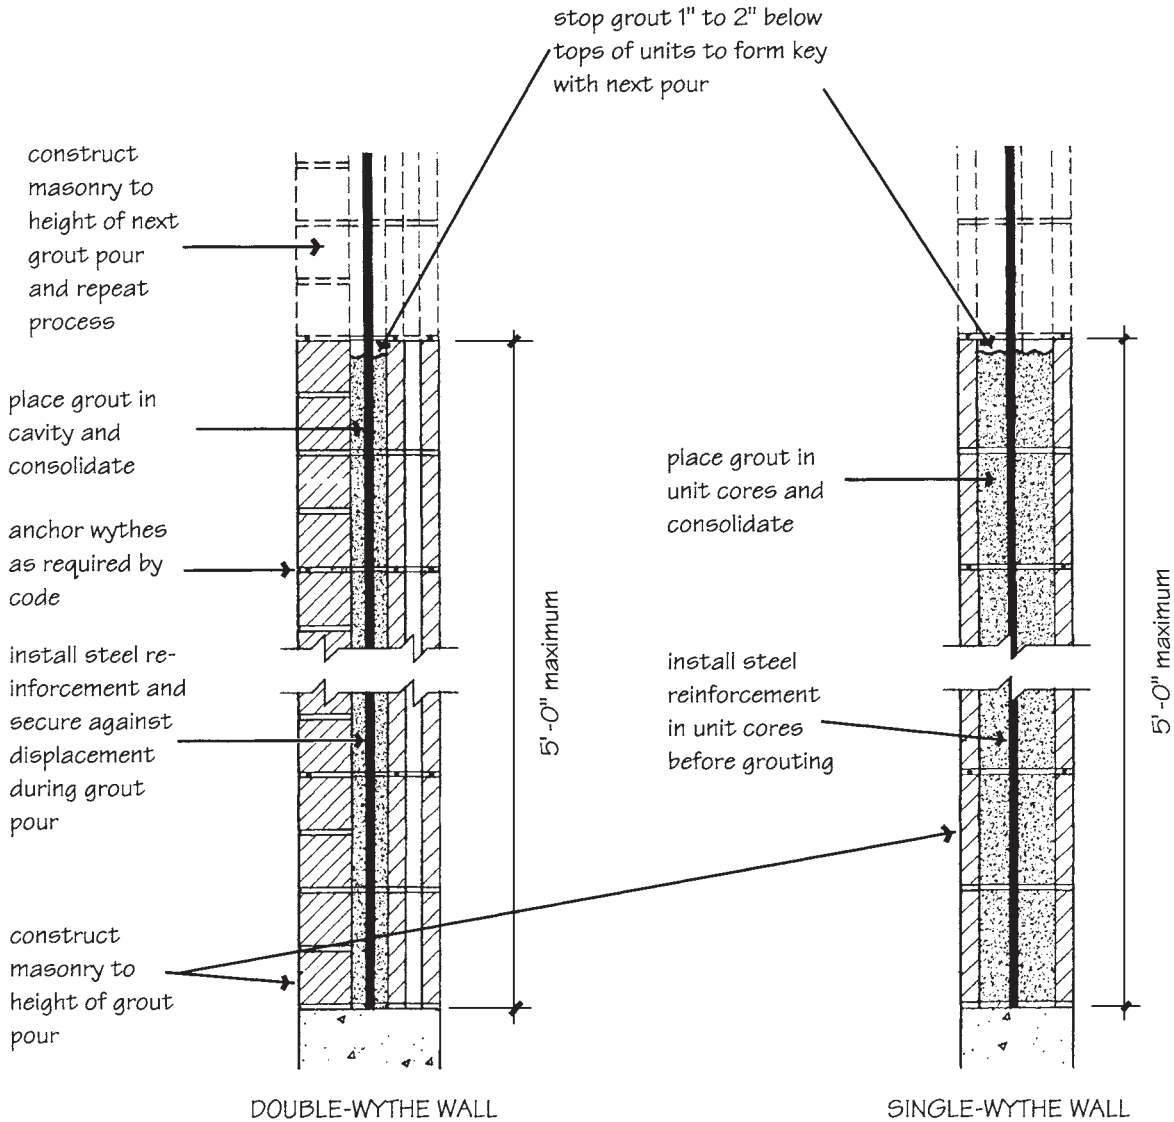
Low-lift grout pours may not exceed 5 ft in height. (From *Grouting Masonry, Masonry Construction Guides Section 7-11, International Masonry Institute, 1997.*)
